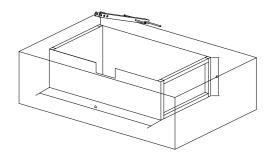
Excavate enough materials to allow for proper depth of concrete footings
